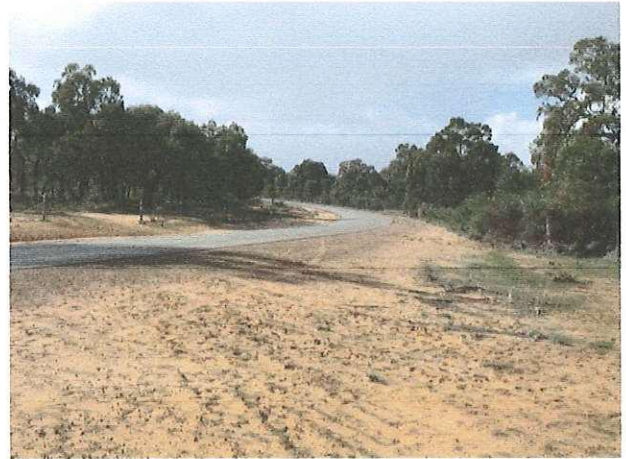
View from exit point along bend towards northern portion of Rowes Road.
